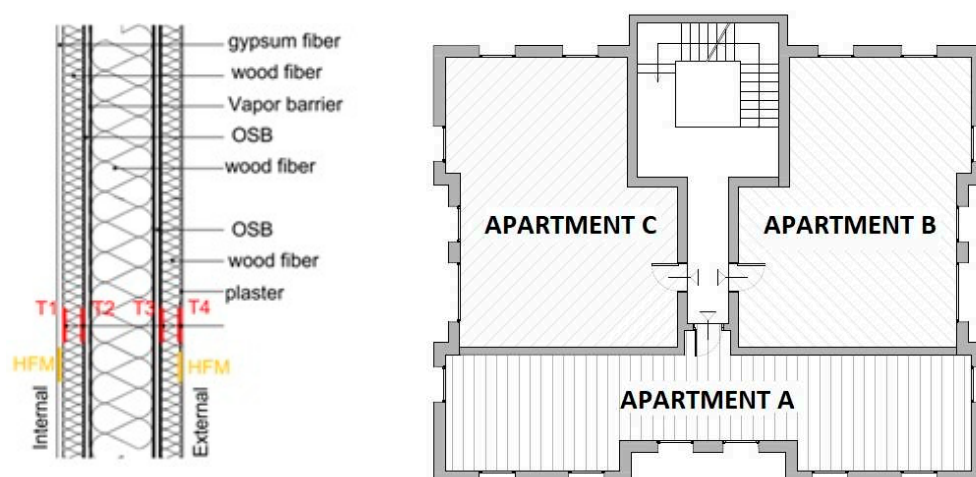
(Left) external wall stratigraphy and probes installed (thermocouples T1–T4 and heat flow meters HFM); (right) building floor layout and showing apartments A, B, and C.
